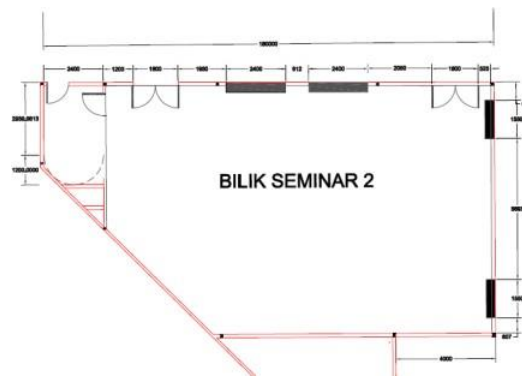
Floor plan of the classroom drawn in AutoCAD
